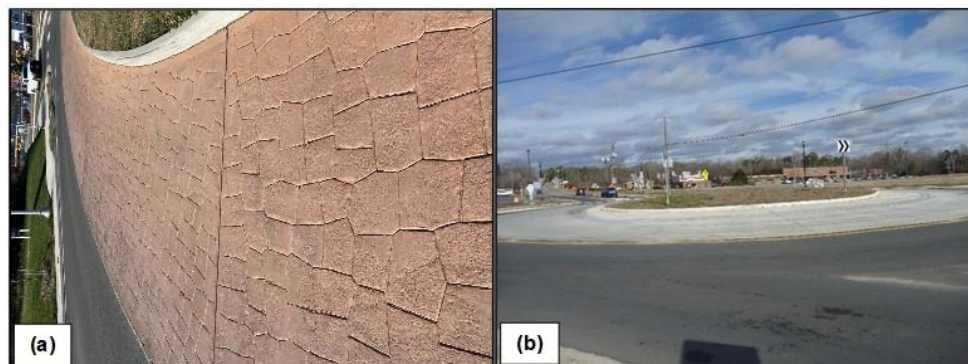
Cast-in-Place Concrete Roundabout Surface Condition in 2023: (a) Maury Street; (b) Fairground Road
